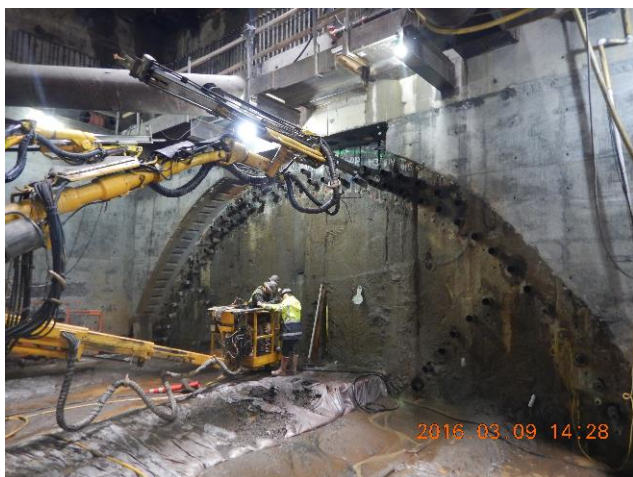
Installation of Barrel Vaults for the Cross Cut Cavern
